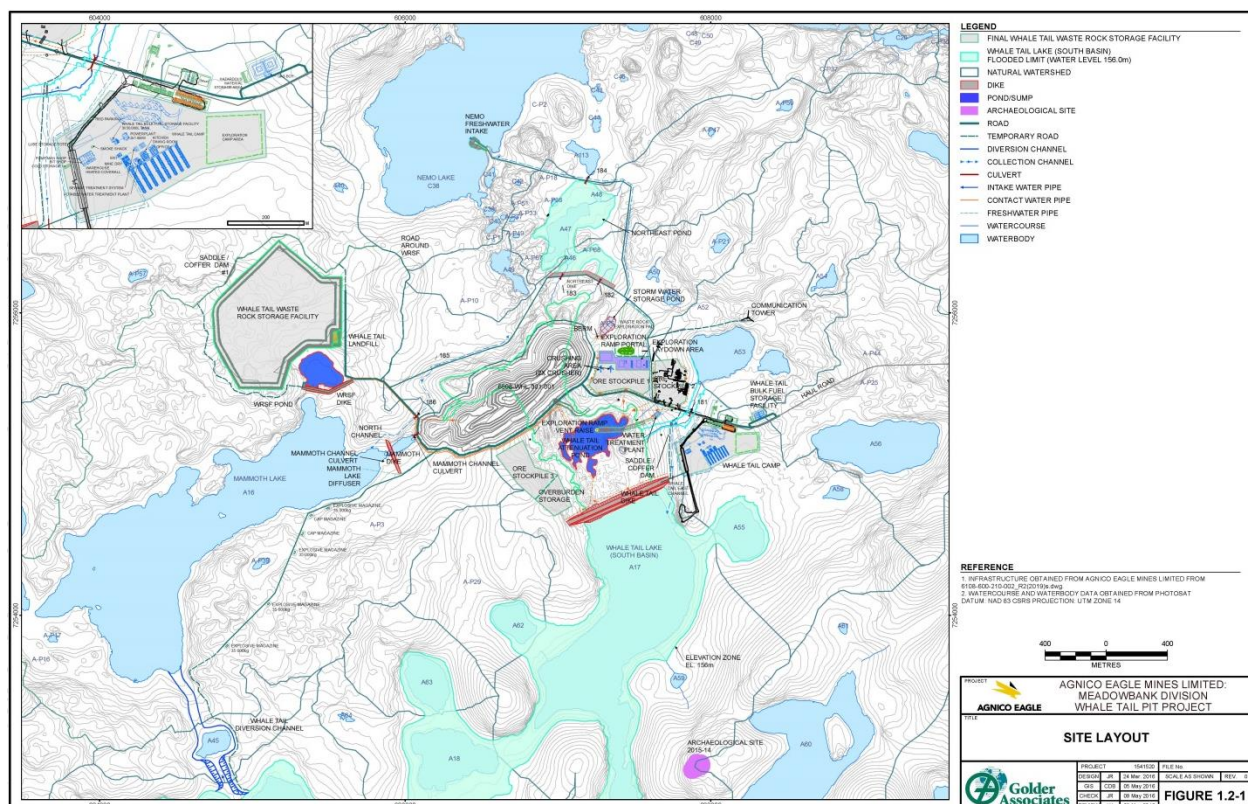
Whale Tail Site Layout (from the Whale Tail Pit Project Proposal Description, Volume 1)
